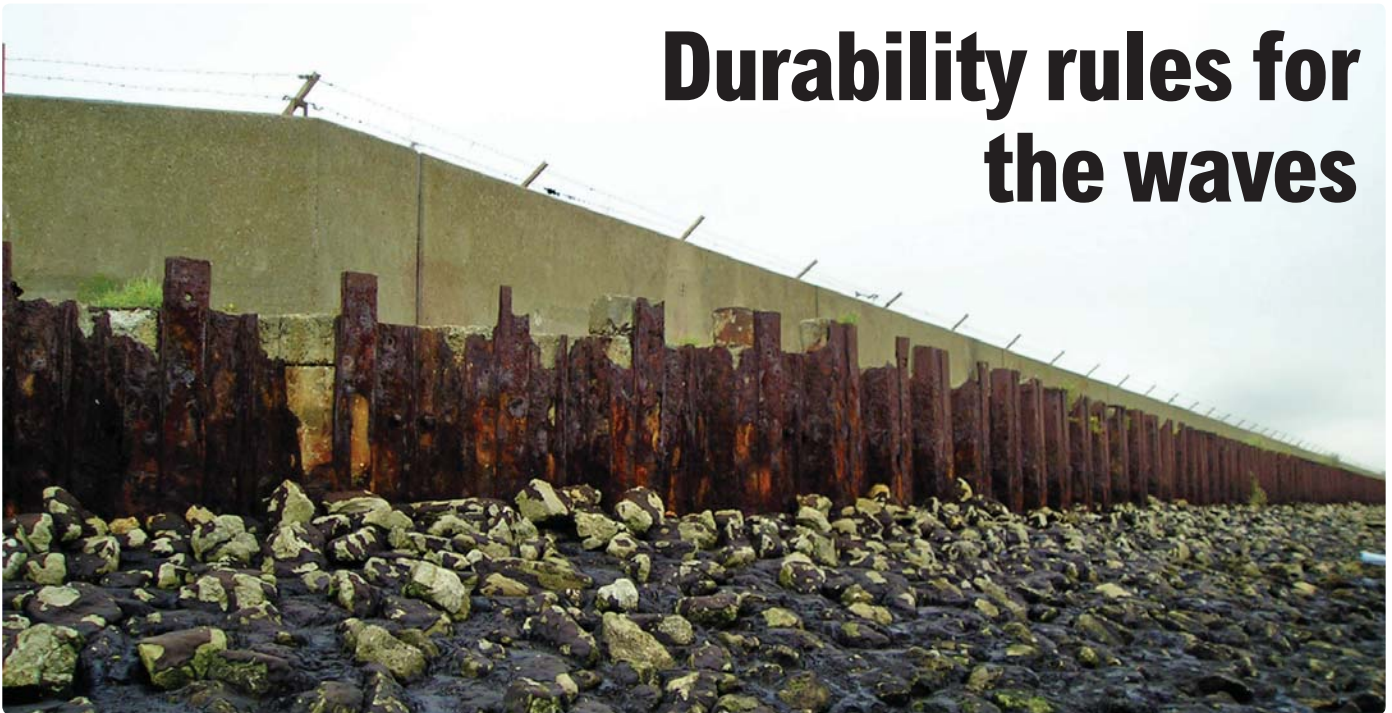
Concrete sea wall as photographed August 2005, constructed 1978. Remains of the original 1960s steel sheet wall shown in foreground.
